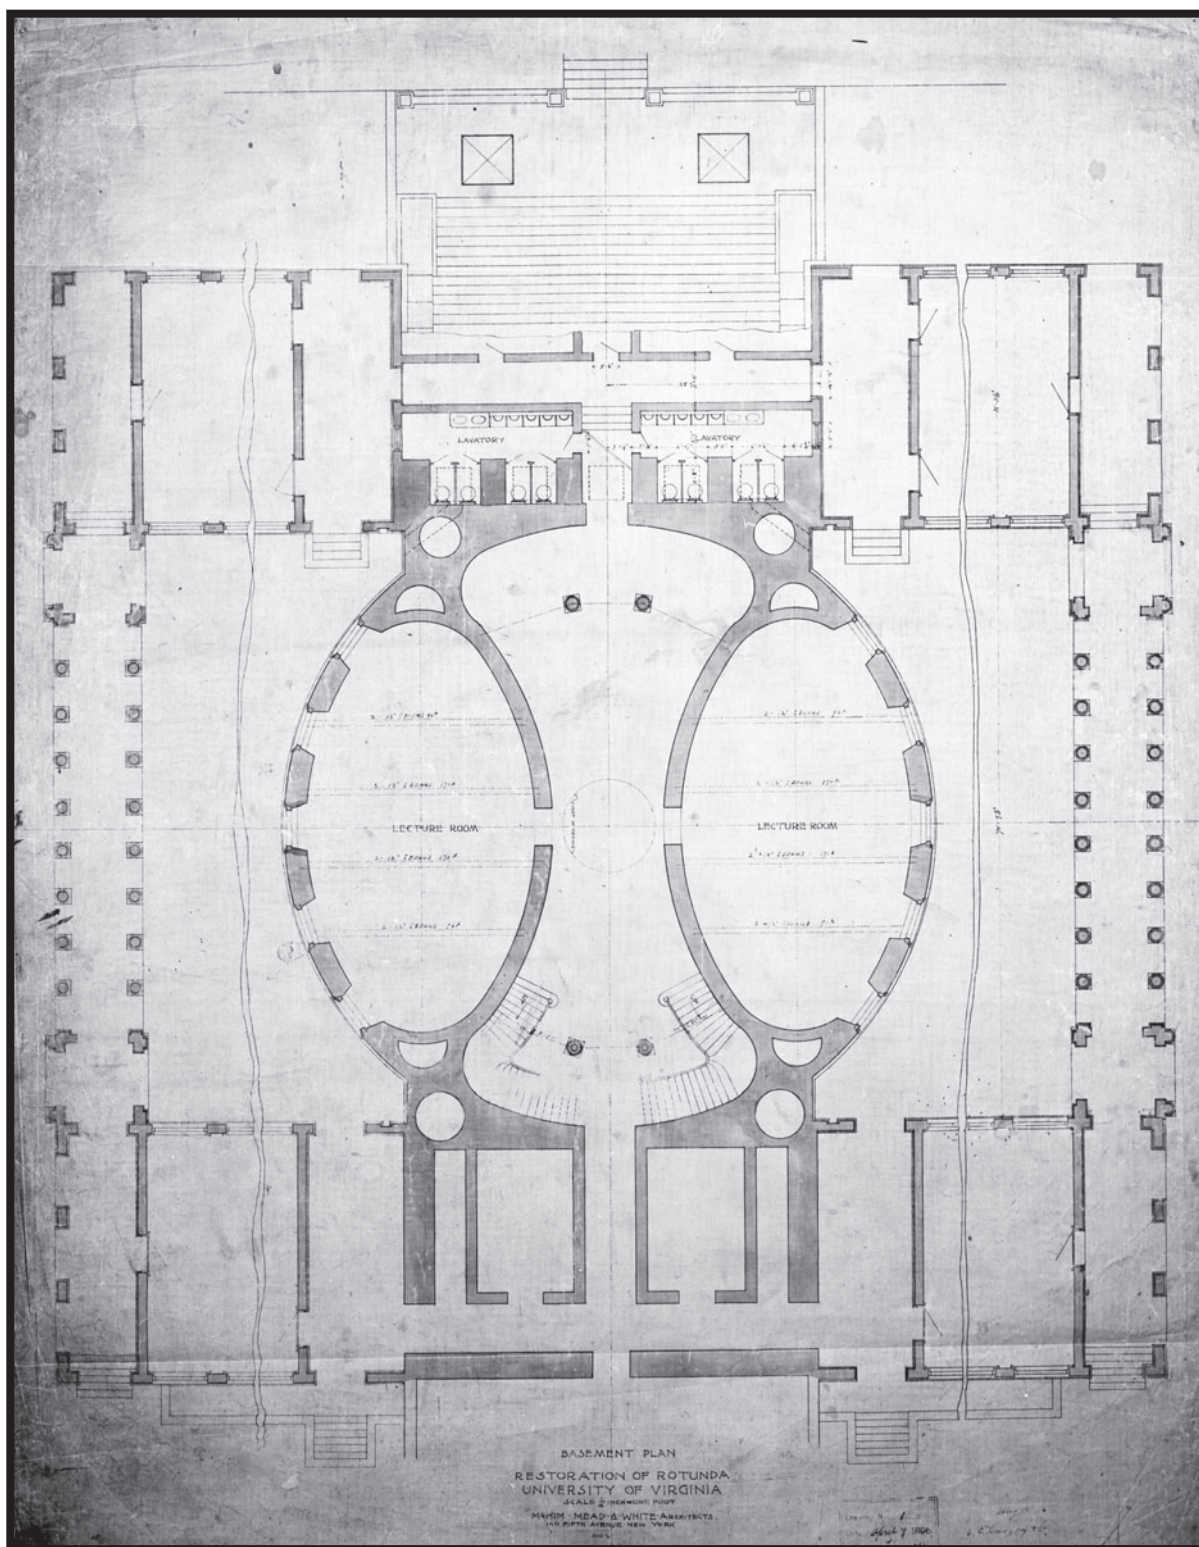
McKim, Mead and White, ground-floor plan, April 9, 1896.
